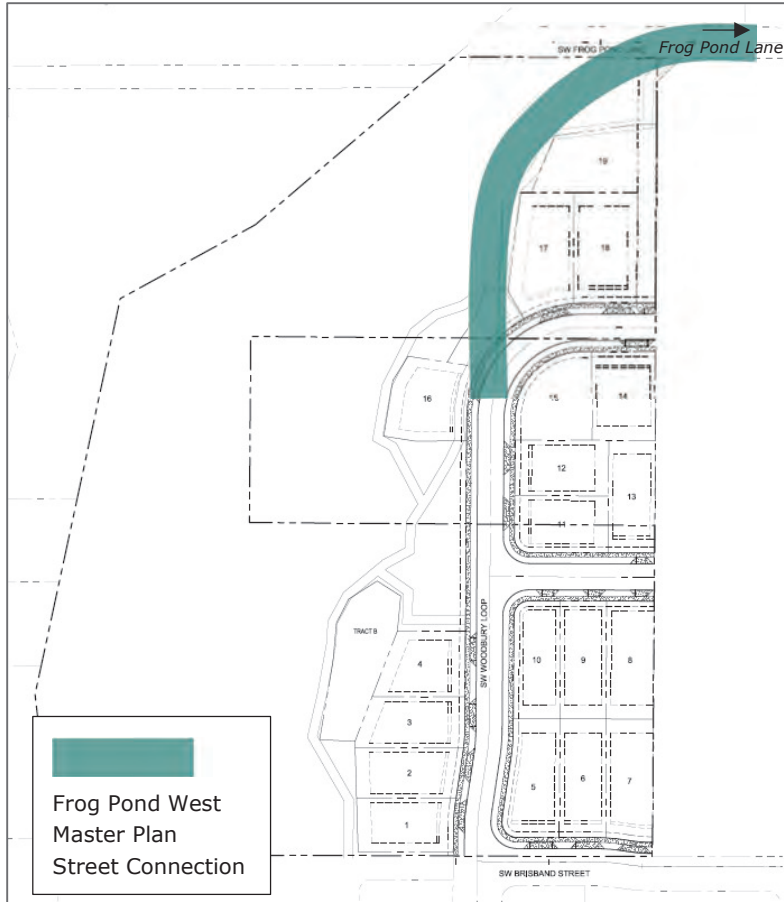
MASTER PLAN CONNECTION TO FROG POND LANE
